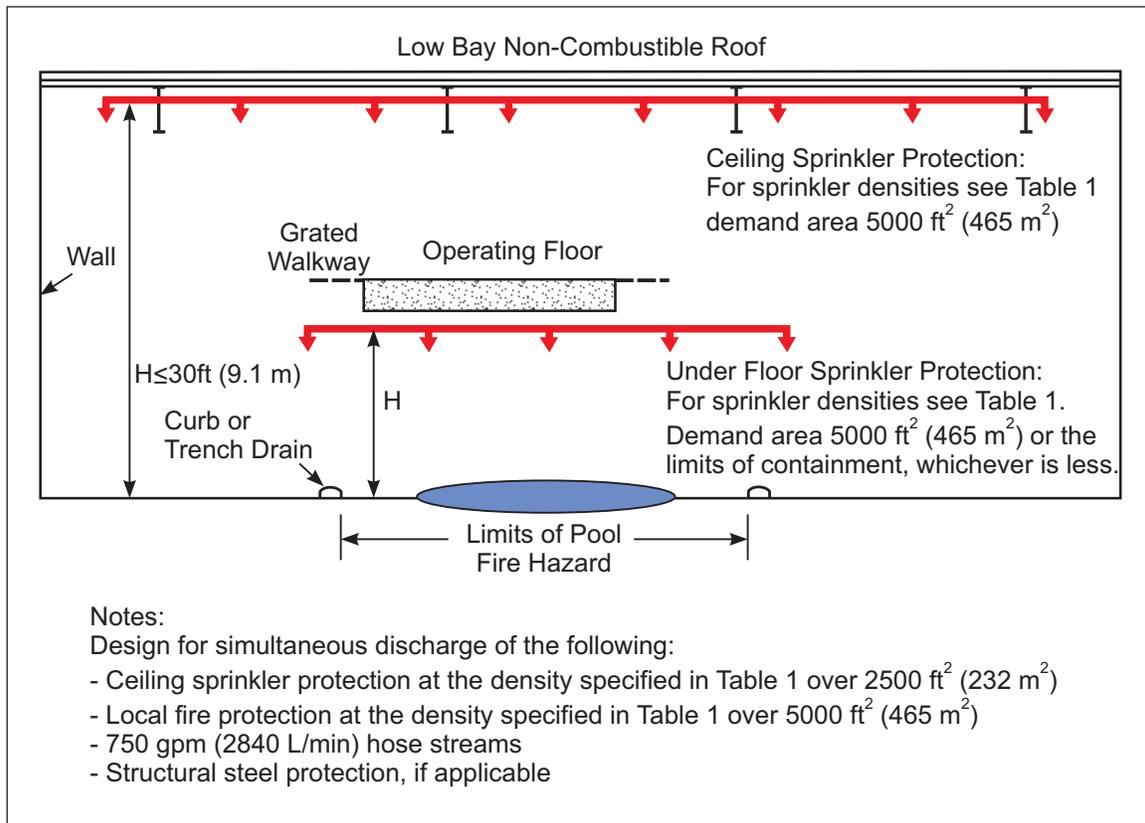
Protection for island-type turbine buildings with roof height within Table 1 or less
